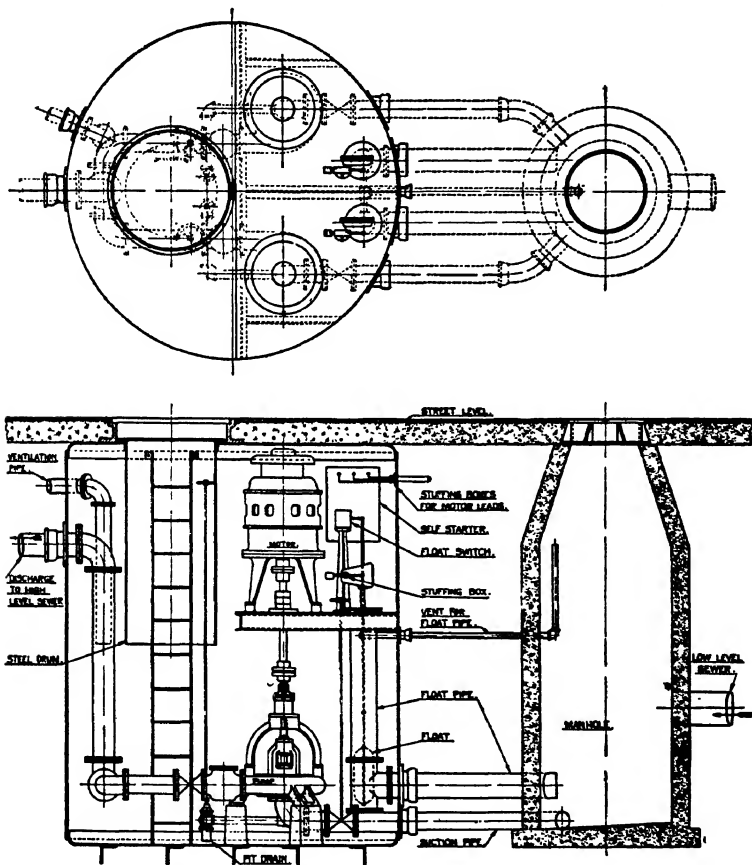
Yeomans flood-proof underground sewage pumping station.
